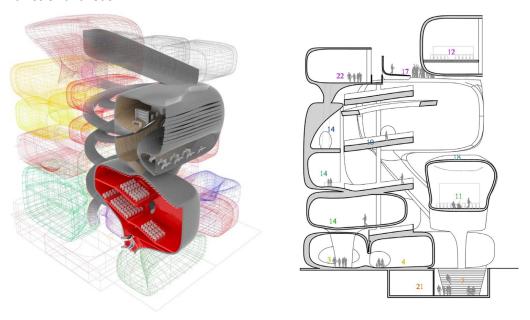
SECTIONS OF ERICK KRISTANTO'S PROPOSED CARTOON MUSEUM, NEW YORK
